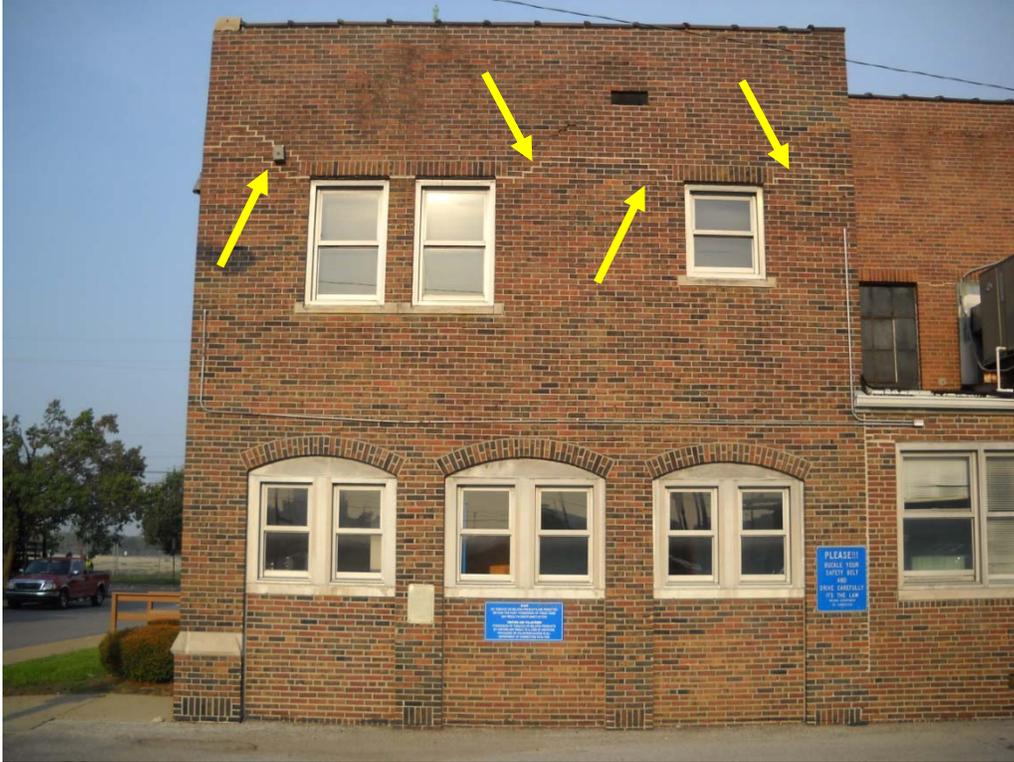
Previously repaired cracks in brick masonry on the east elevation
